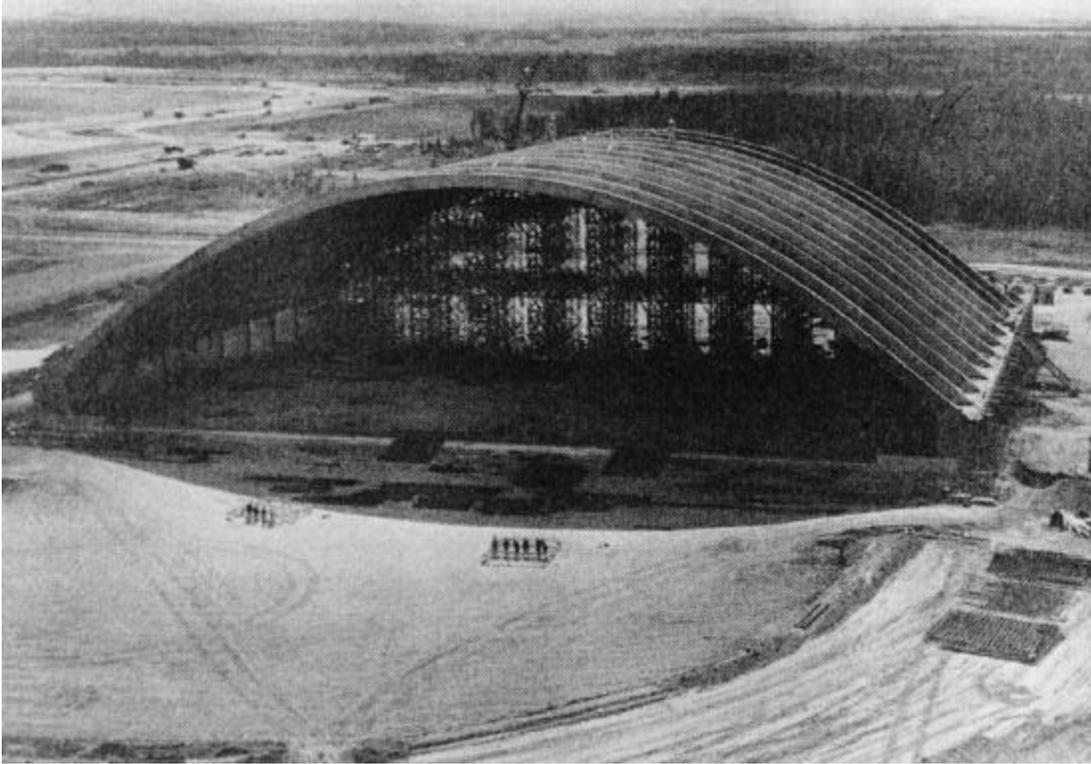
Anton Tedesko, Roberts & Schaefer. Construction, B-36 hangar at Loring Air Force Base, September 1948. Reproduced from *Army Engineers in New England* (1978).
